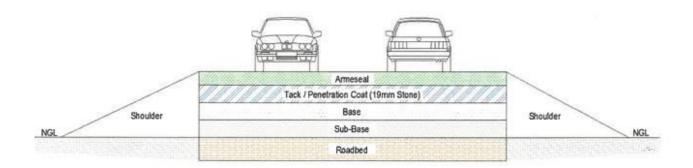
Proposed typical cross-section of road layers constructed with SprayCo Armaseal, (Adopted by HEC
